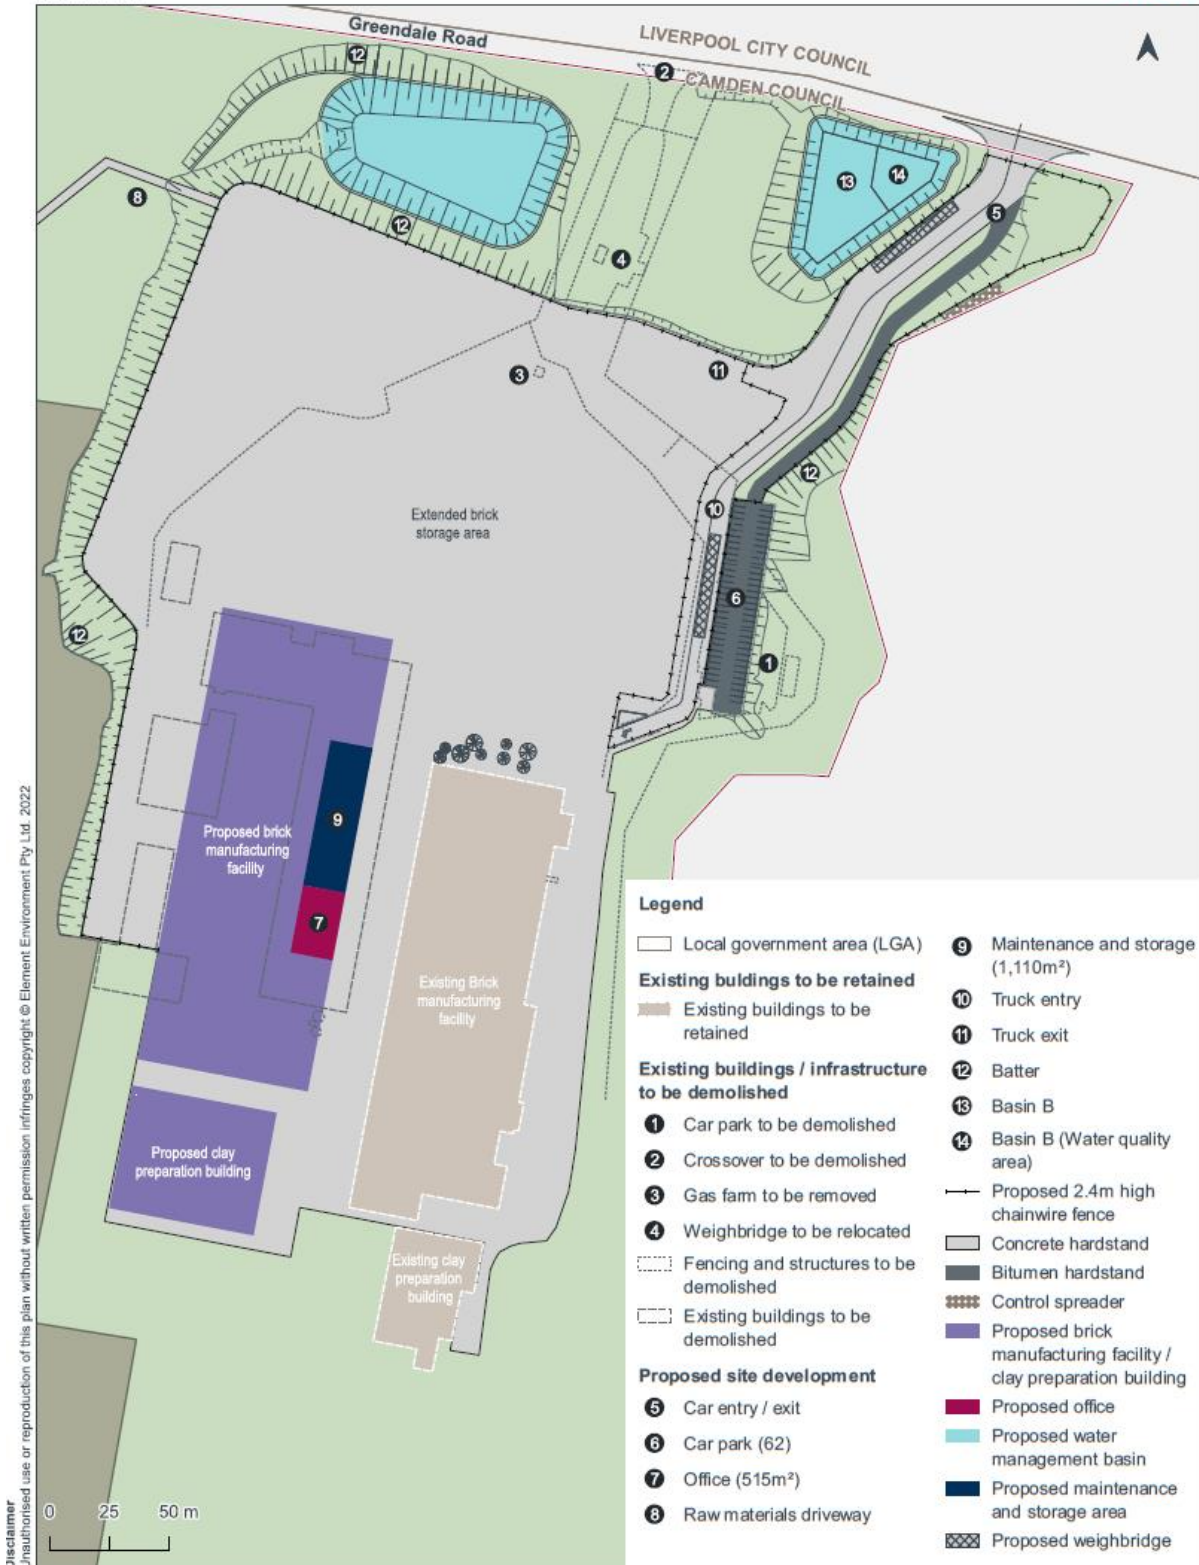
Proposed Bringelly Brickworks Extension Project site development plan (Modification 2)
